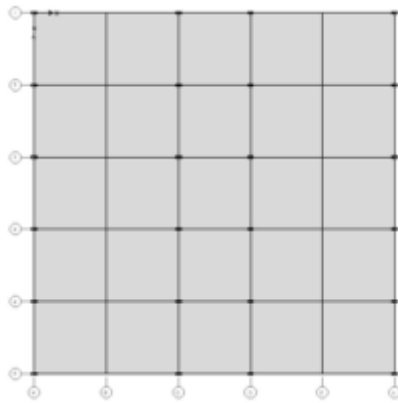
Plan\_of GF with floating Column Model-2
